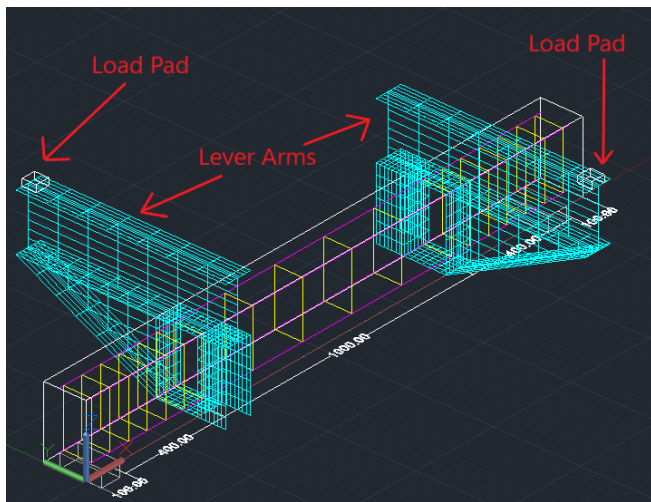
Idealized geometry and longitudinal spans in between loading arms and supports on the concrete beam
